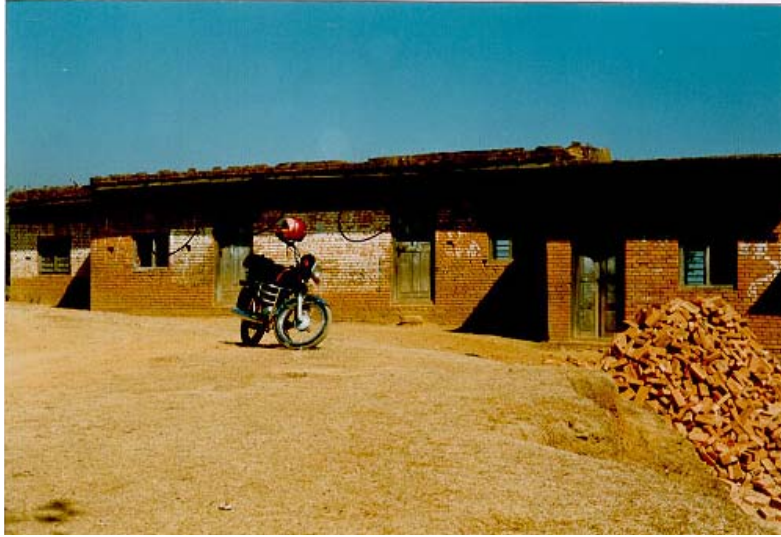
CGI sheet laid over Timber truss. [NSET-Nepal's Archive]
